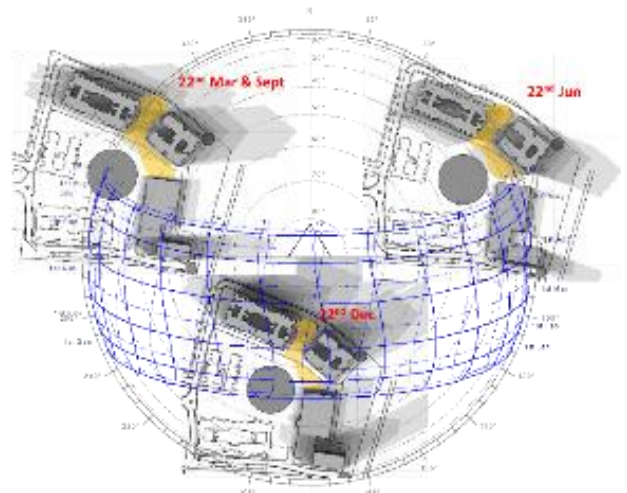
Hourly shadow pattern of the buildings on typical days highlighting space left building the building blocks
